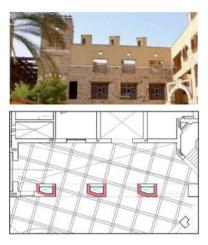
Wind towers in Administration building-plan and elevation (Source, Author)
